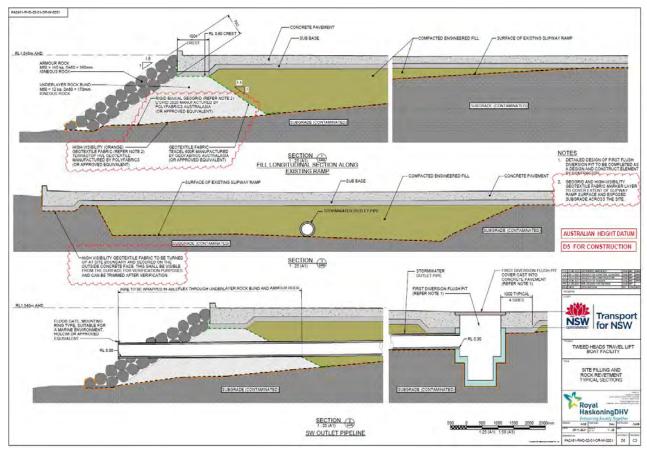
Design details of proposed geotextile fabric marker layer and geogrid
